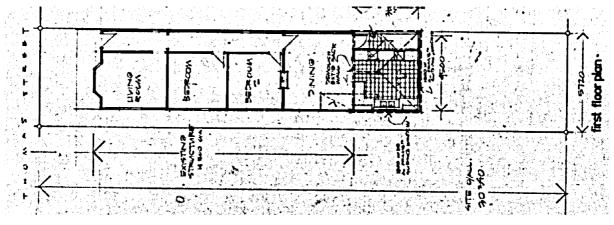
Building Application dated 1981 showing extension to the rear (north is down the page).
